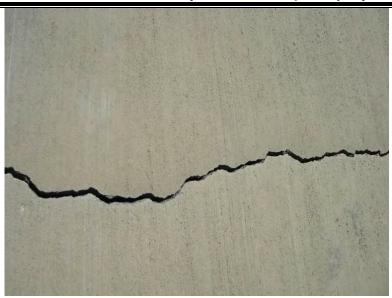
Terminal Basin Exterior Wall: May 1, 2013
